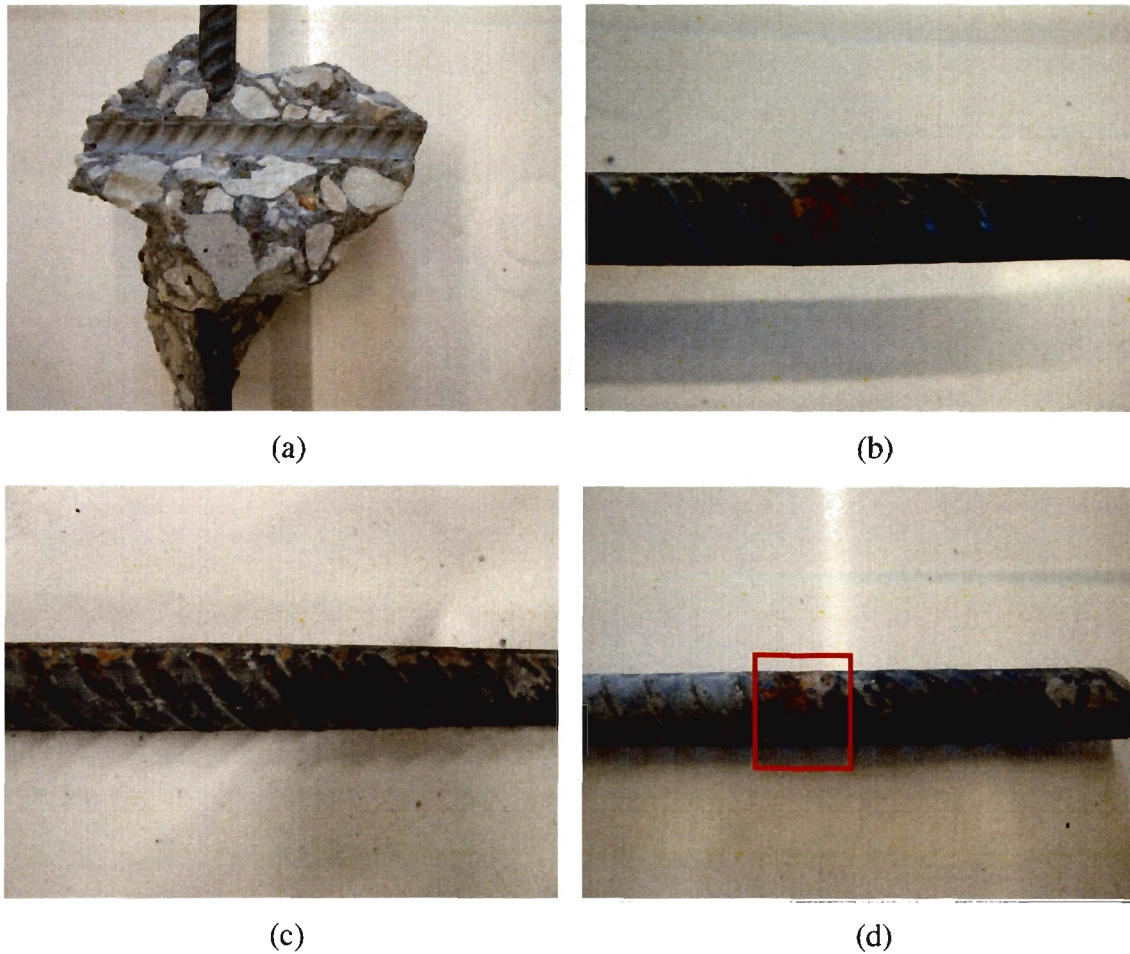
Reinforcement examination of Mix No. 1 containing 4 bars. (a) Vertical rebar embedded in concrete with transverse rebar removed showing no signs of corrosion on the concrete. (b) Indication of corrosion formation on rebar at $\frac{1}{2}$ in. (12.5 mm) from reservoir surface. (c) Minimal signs of corrosion on rebar at $\frac{1}{2}$ in. (12.5 mm) from reservoir surface. (d) Little to no rust formation on rebar at 1 in. (25 mm) from reservoir surface.
